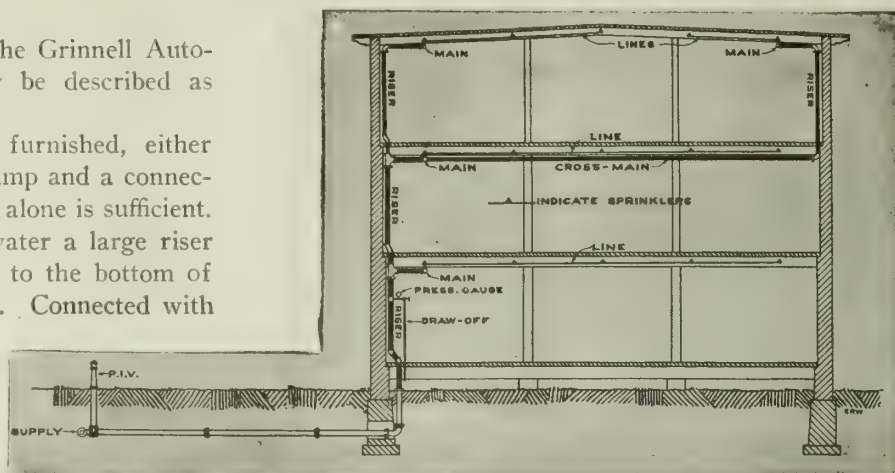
SECTION OF BUILDING EQUIPPED WITH GRINNELL AUTOMATIC SPRINKLER SYSTEM SHOWING CONNECTIONS AND PIPING
